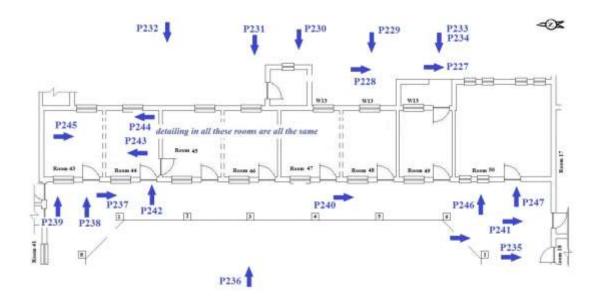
Above is the schematic representation of the layout of Drawing 10 with places where photos were taken from are marked. (Drawing S.M. Miller 2016.)
